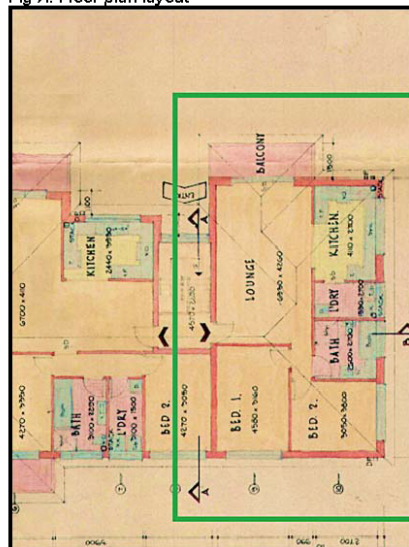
Figure B: Typical unit layout for the ground Level 1 & Level 2. Unit block is angled to the boundary and receives sun to its façade as shown in the sun eye diagrams.
